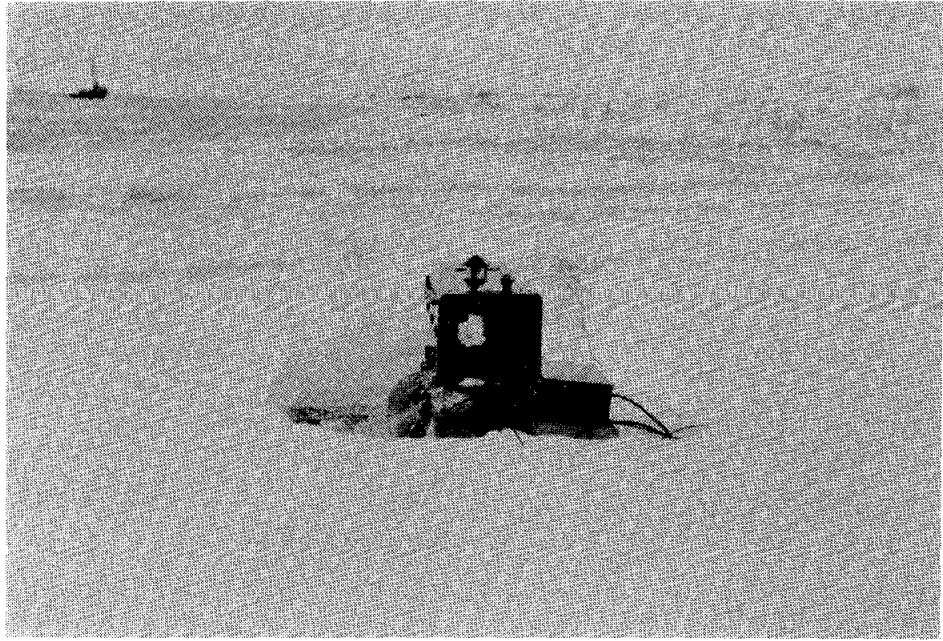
Another view of unit taken at same time as Photo 7, looking into approach from rear of PLASI. Drill rig at top left is about on runway centerline at site of runway failure.
